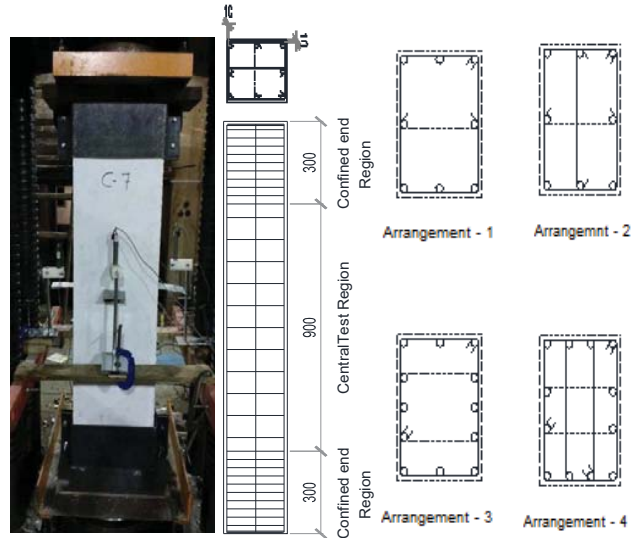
Cross-sectional arrangements and section geometry of tested columns
